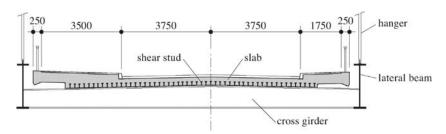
Example of a traditional deck of a composite arch bridge.
